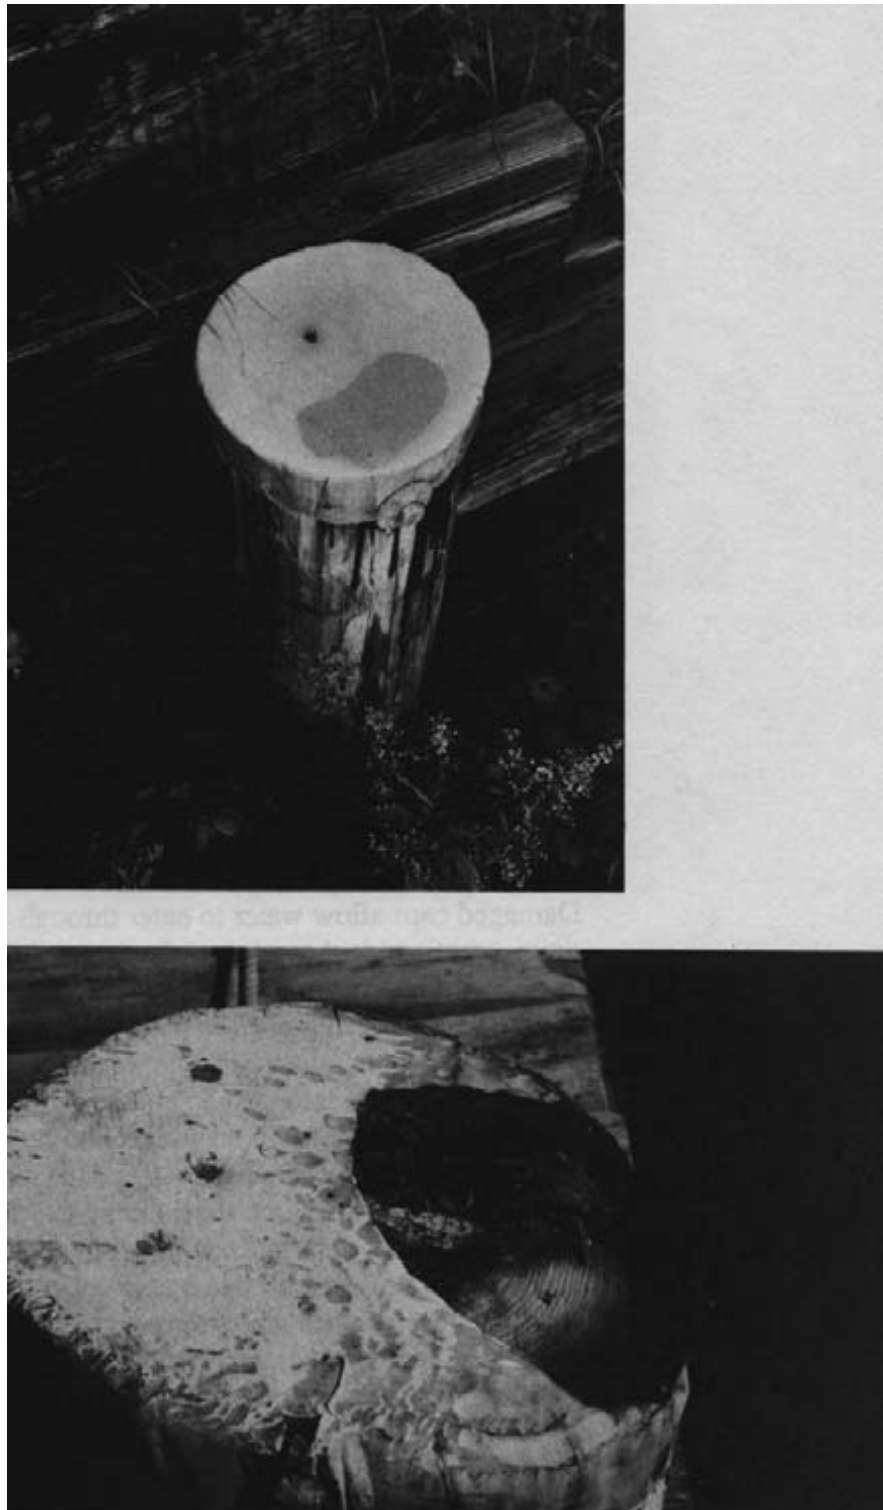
(Top) Damaged metal pile caps allow water to enter, but restrict air circulation and drying. (Bottom) Pile decay is exposed when the damaged cap is removed.
